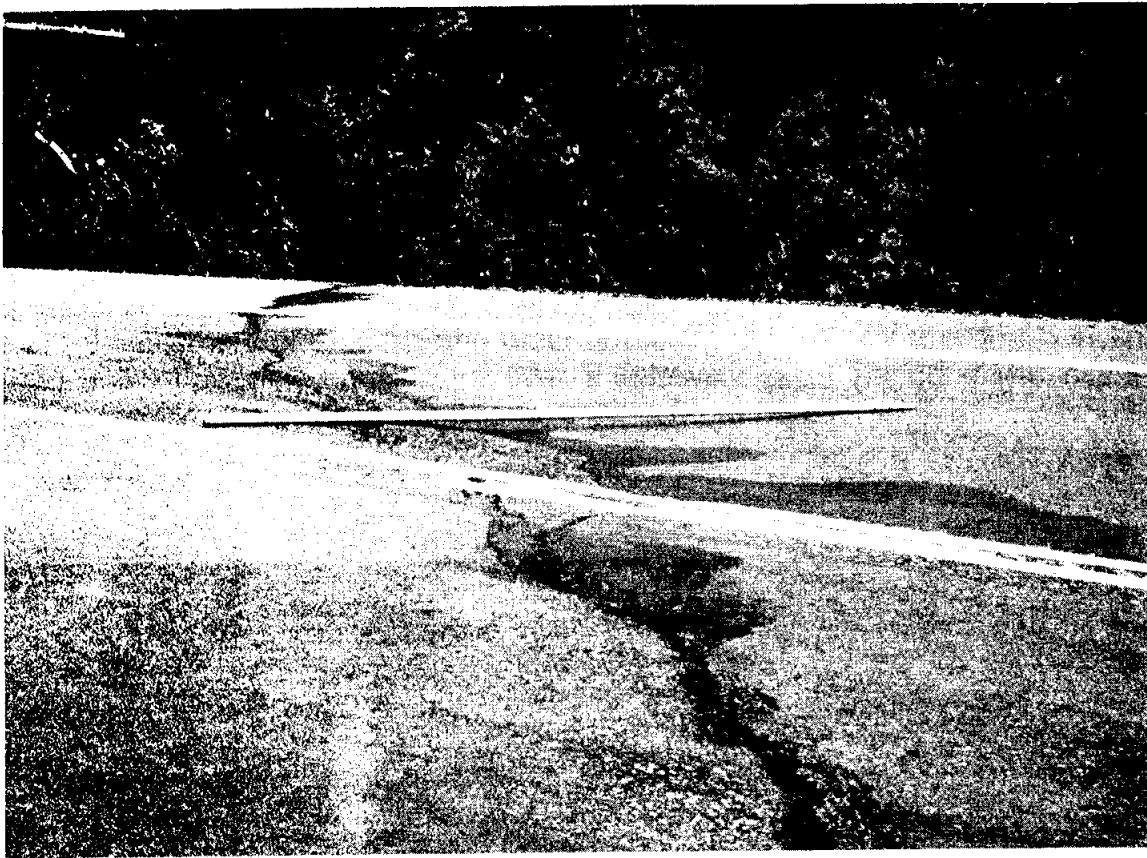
Crack in a 3 layer geotextile section two years after construction. The photo was taken in 1986 near milepost 88 of the Tok Cutoff Highway.
